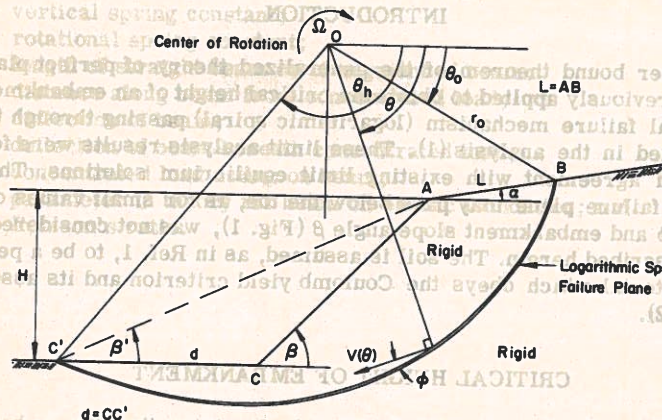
FAILURE MECHANISM FOR STABILITY OF SLOPES WITH FAILURE PLANE PASSING BELOW TOE
